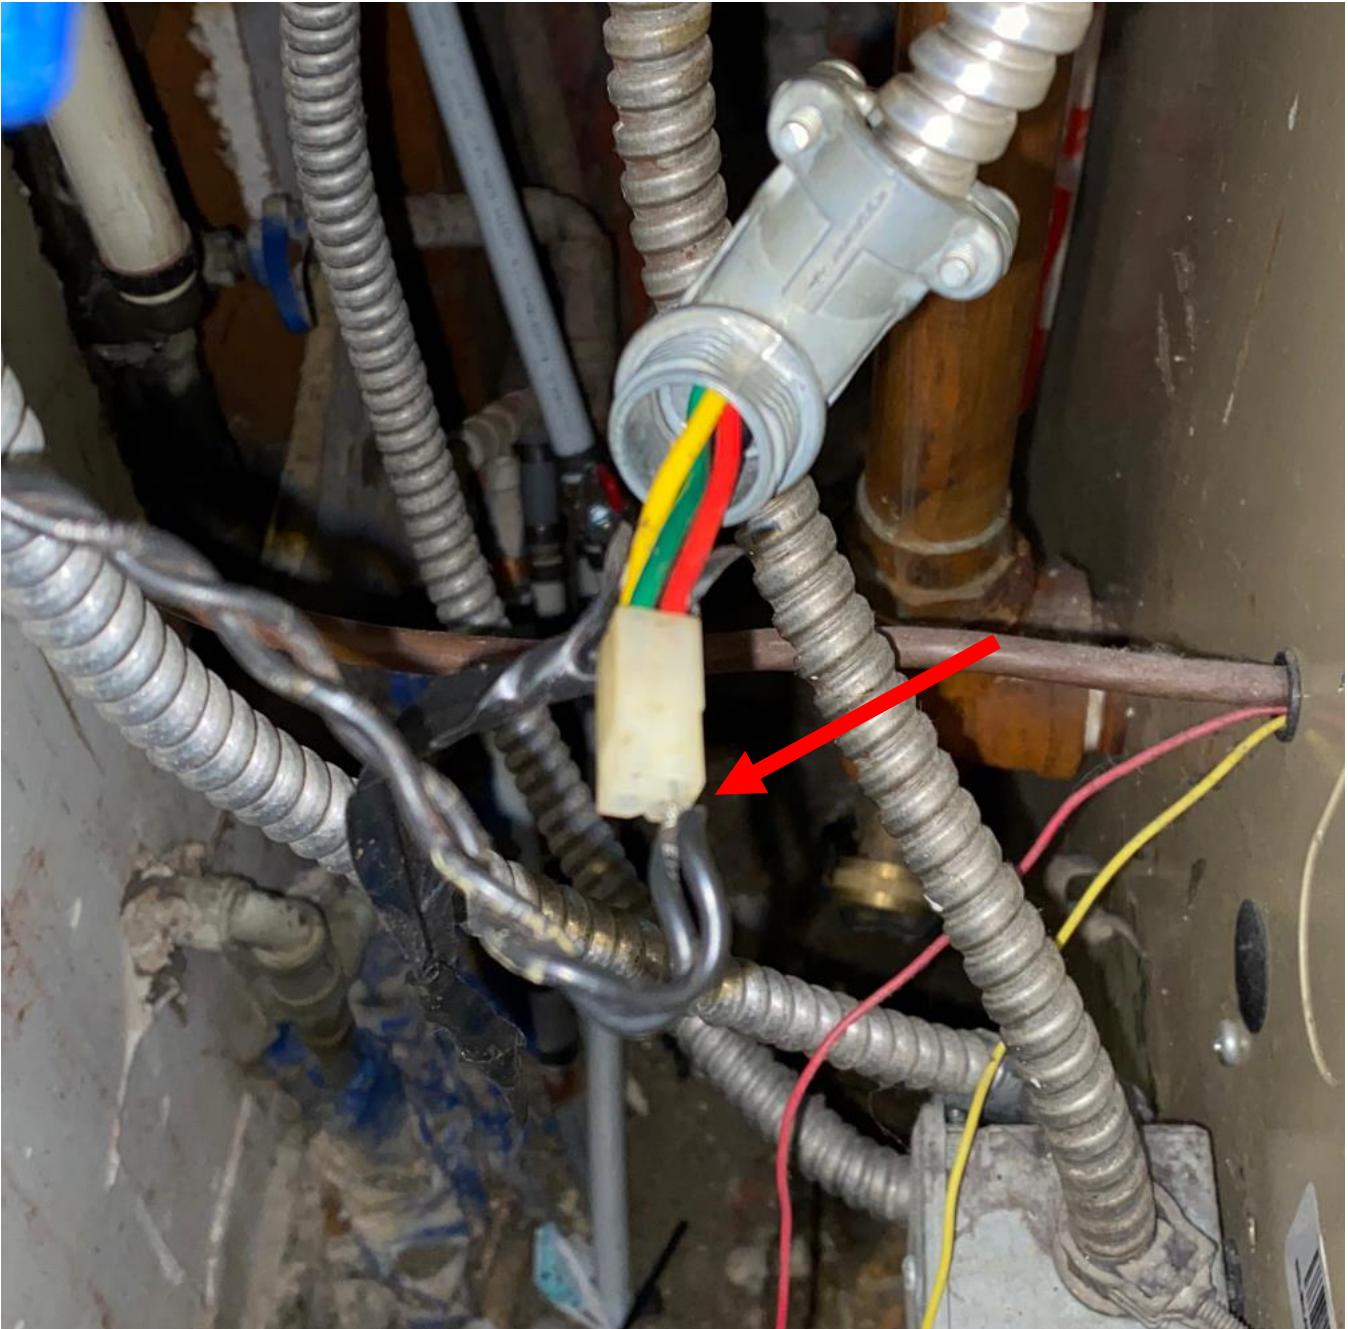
Jumper #2 electrical wire bypassing the damper motor end switch
